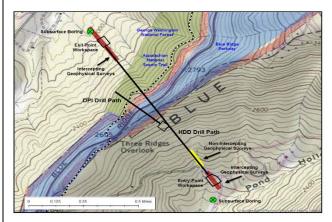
Locations of subsurface borings and geophysical surveys conducted for the proposed Blue Ridge HDD crossing. From Geotechnical Site Investigation Report for Atlantic Coast Pipeline Horizontal Directionally Drilled Crossing, Blue Ridge
